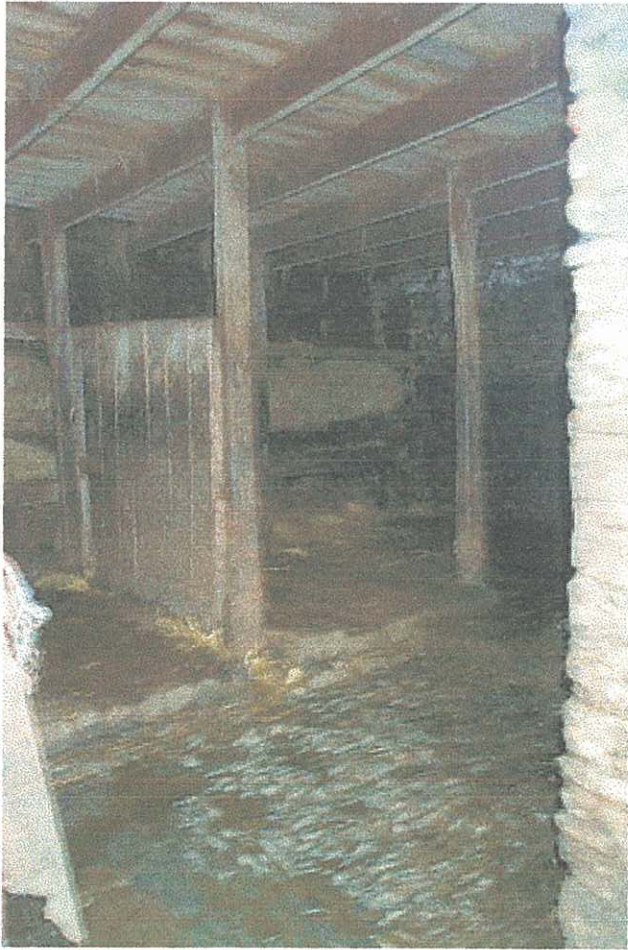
the barn interior showing the original pitched stone floor and stalls.
